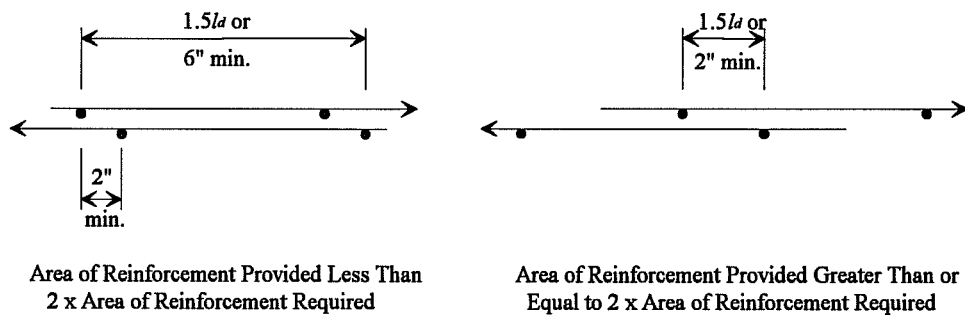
Splice Requirements for Welded Deformed Wire Fabric
